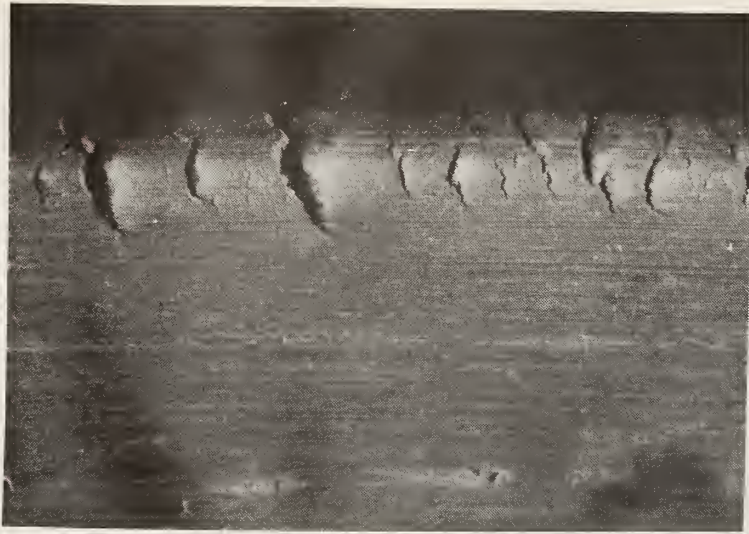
View of member A showing cracks at the edge of the flange near fracture X 7.
